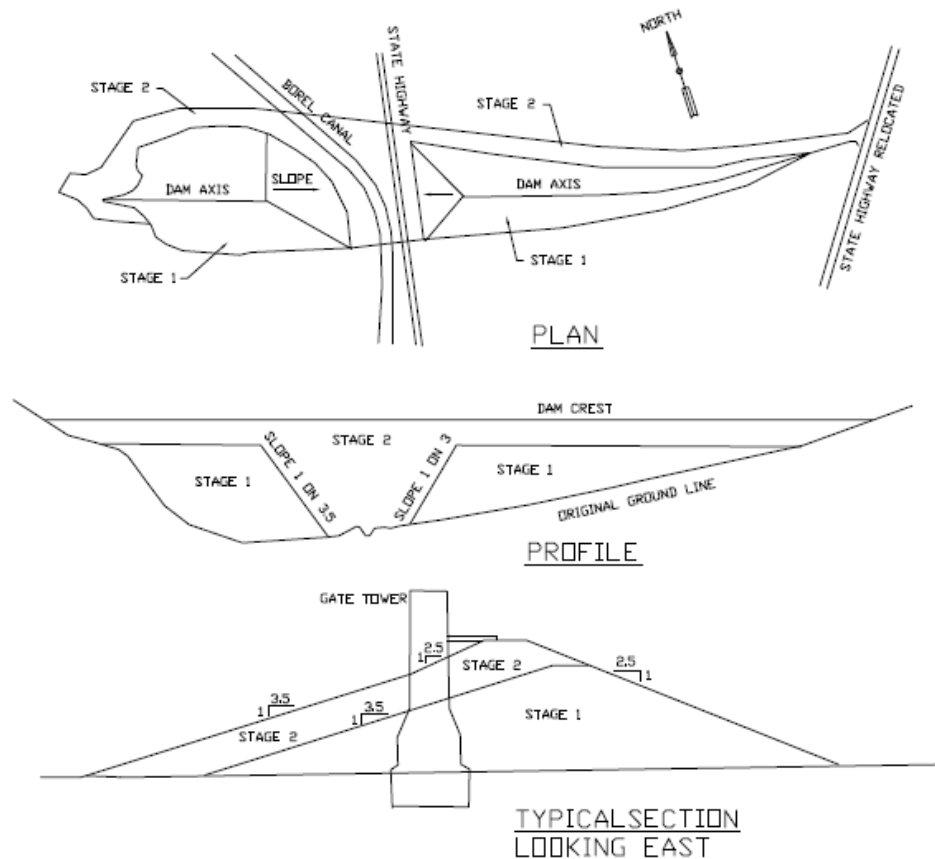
Plan View and Typical Cross Section of the Isabella Auxiliary Dam
